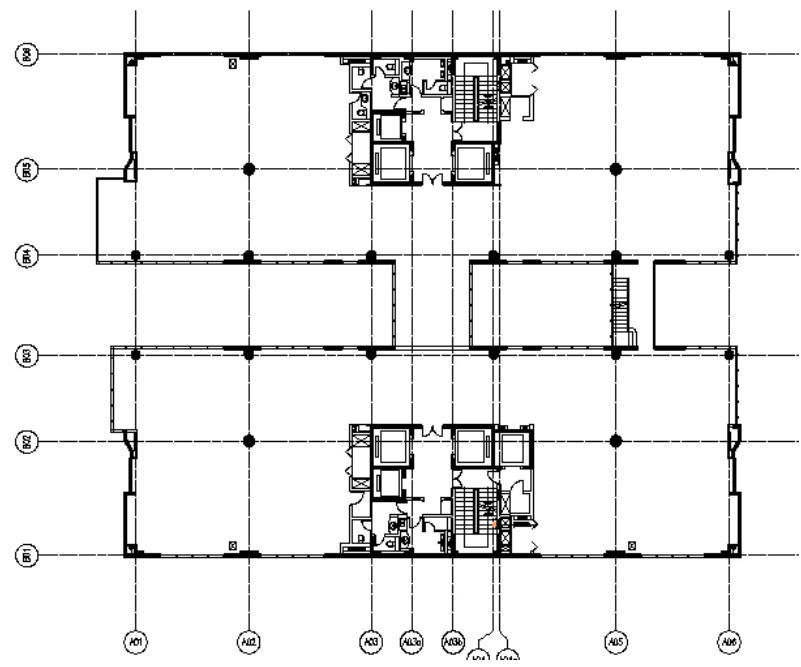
Birla Corporate Office, New Delhi: Sixth & Eighth Floor Plan
